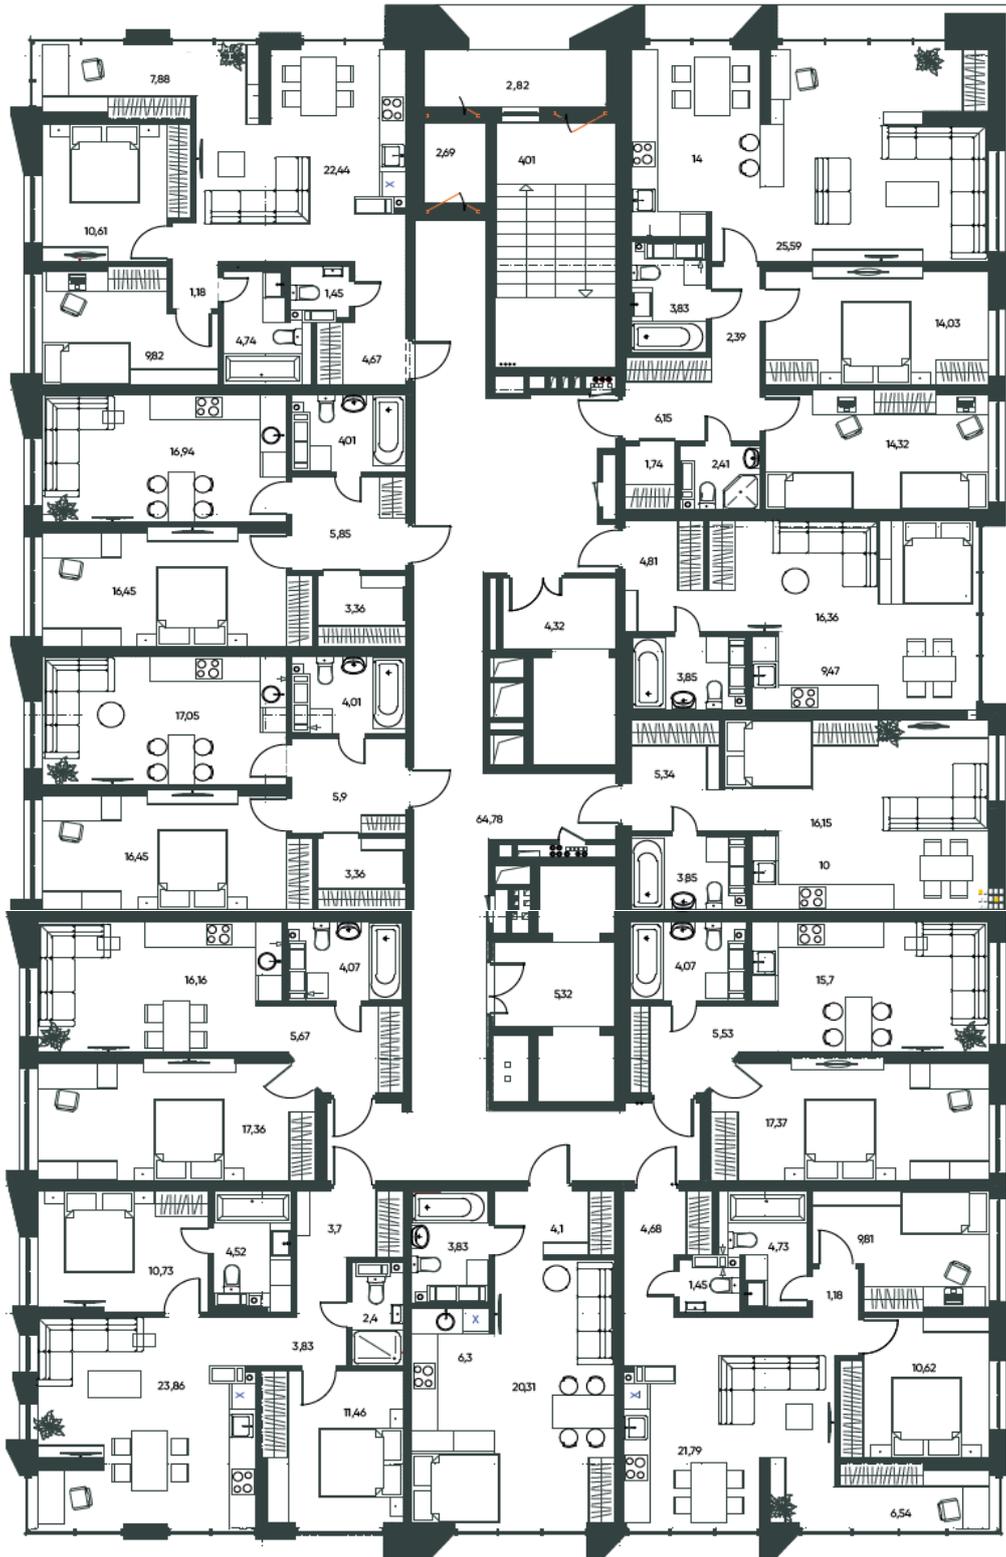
Corridor-section single-section residential building (11 small apartments per floor). Typical floor plan. Residential complex Central Hills, Kyiv. Design organization: LLC Ukrainian Engineering and Innovation Company, chief architect of the project V.M. Mykhailchenko [26]
